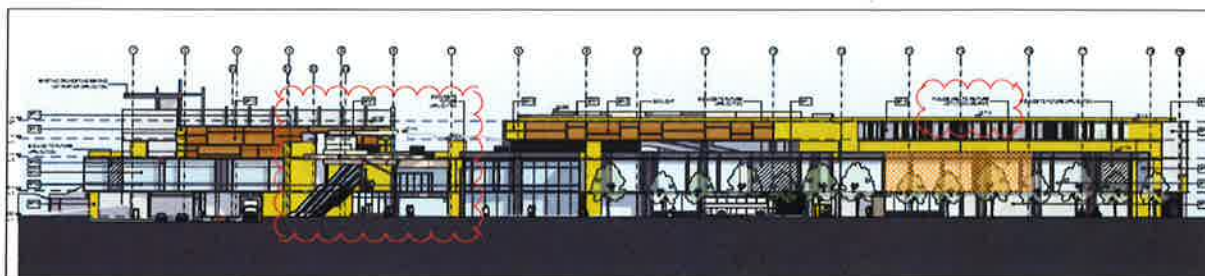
Southern Elevation - Captain Cook Drive (Approved MOD 6)
